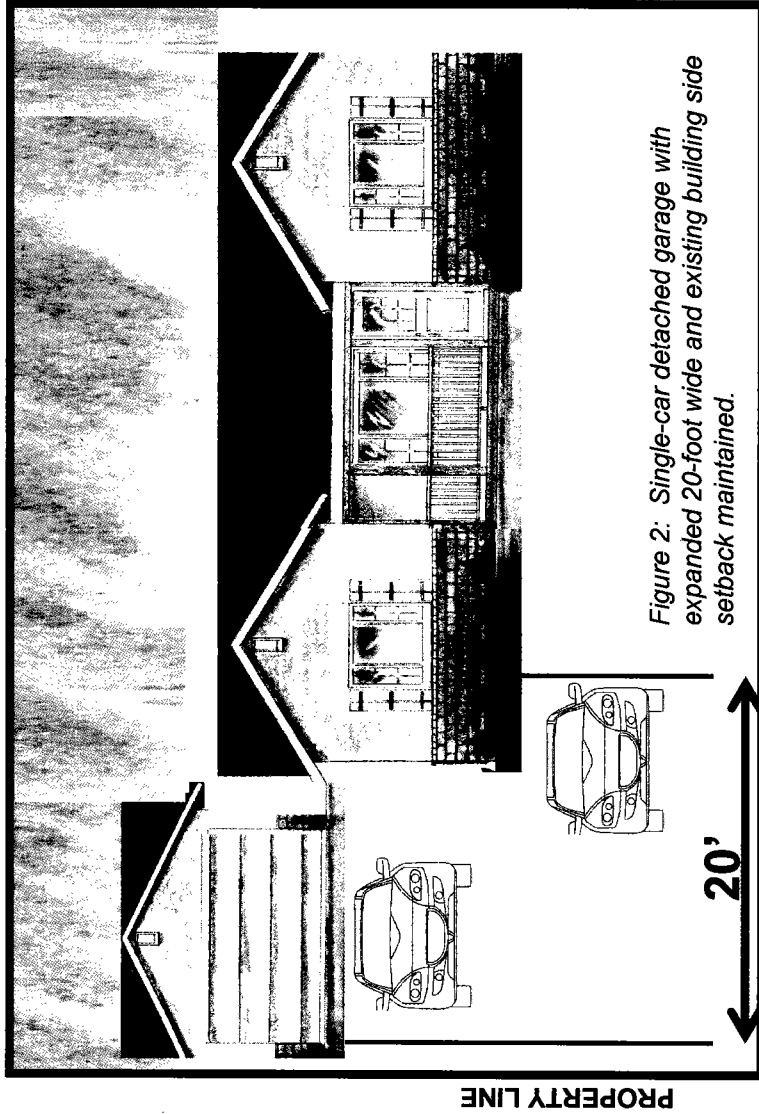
Single-car detached garage with expanded 20-foot wide and existing building side setback maintained.
